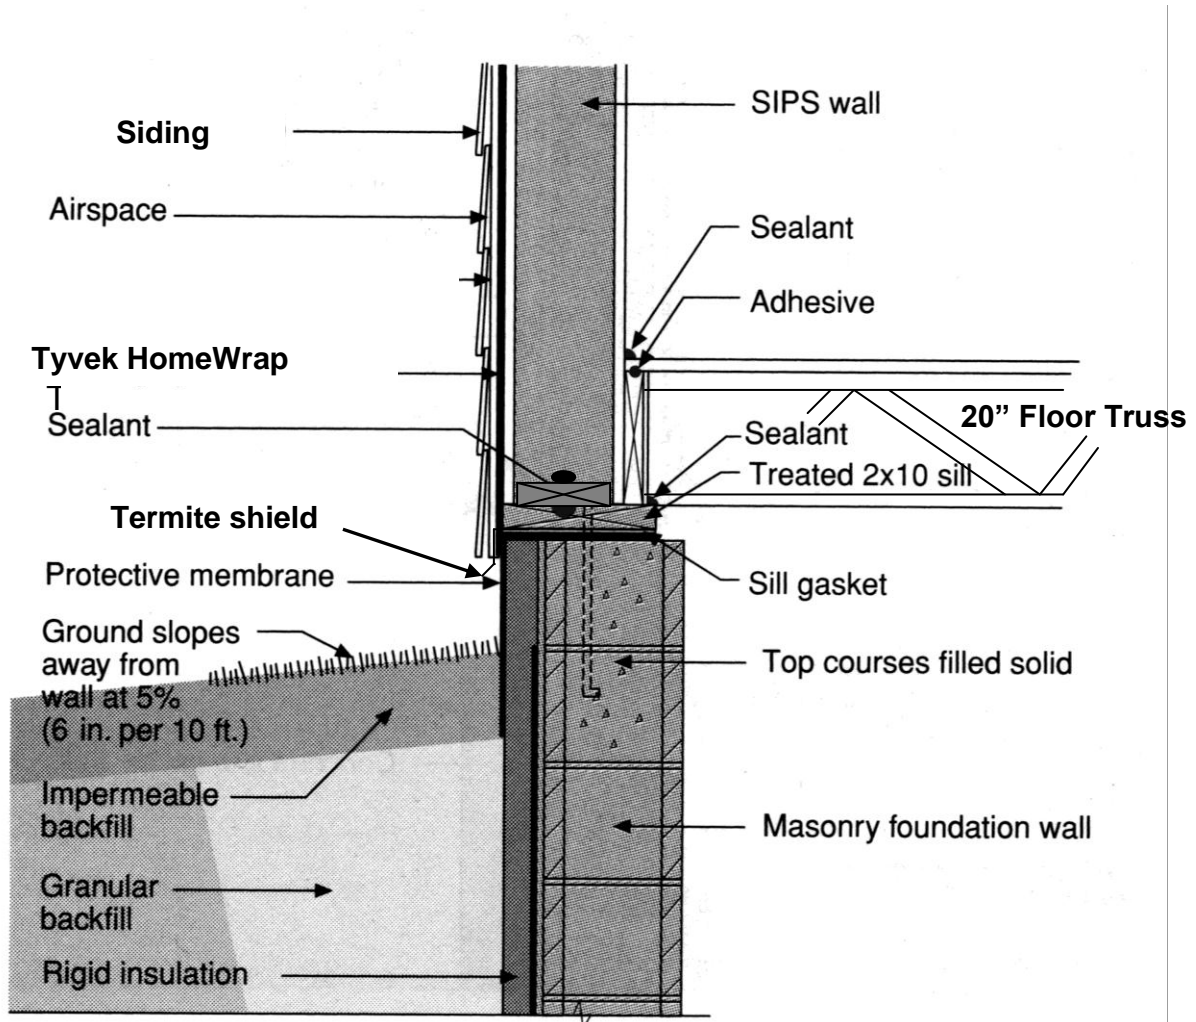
ZEH5 Foundation/floor/SIP wall detail.
